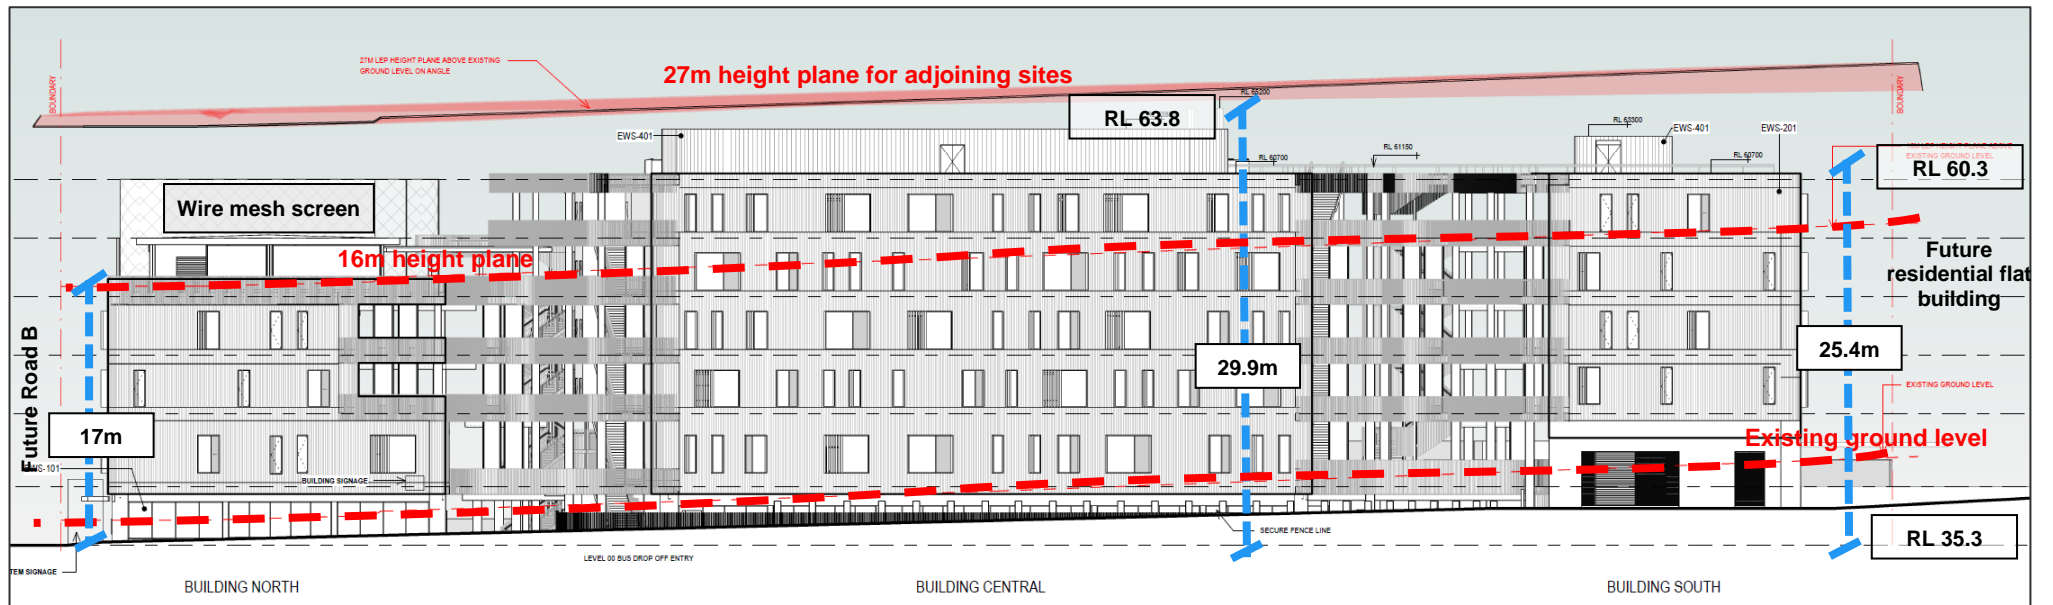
| Future Fontana Drive elevation (Source: Applicant's SRtS)
